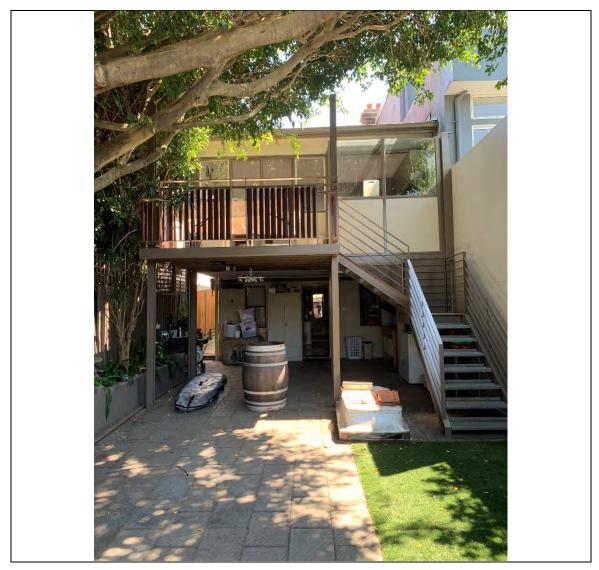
Site viewed from private open space, looking towards the rear of the dwelling.
